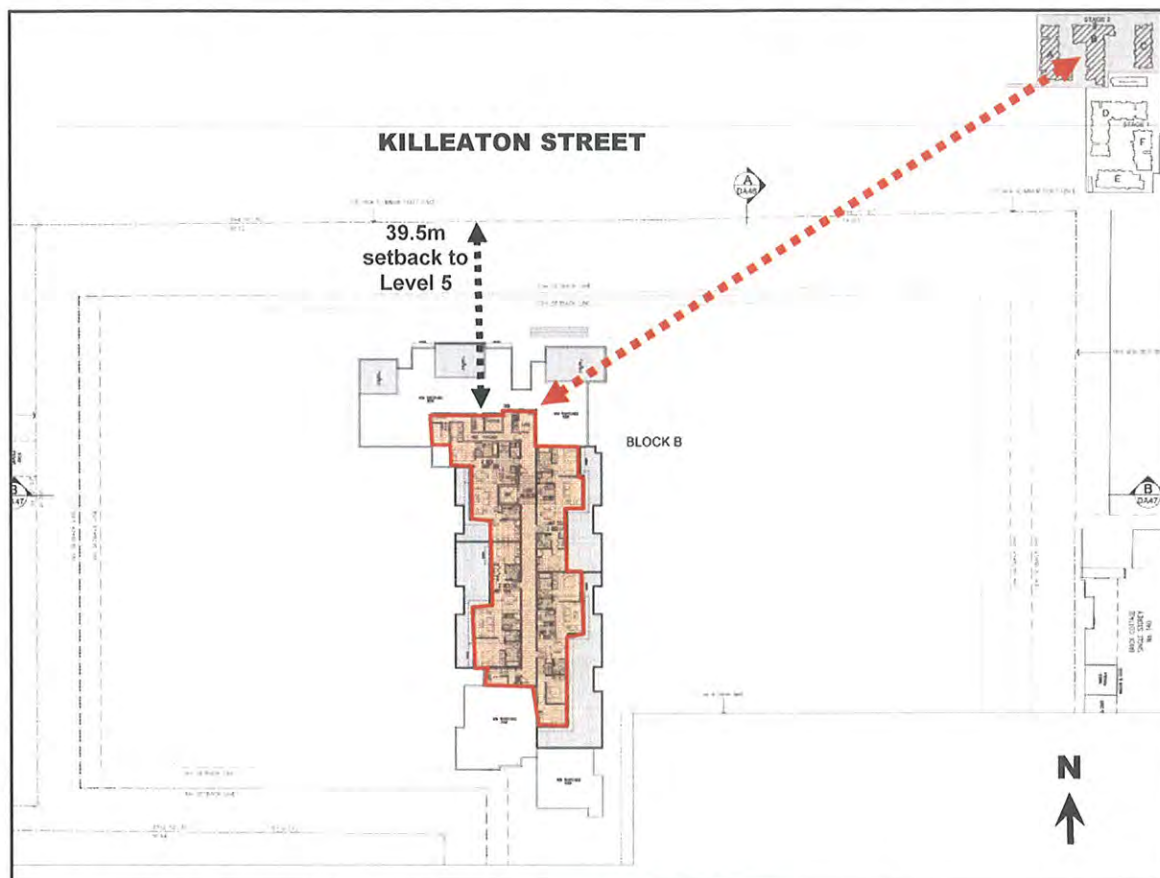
Building B/Level 5 plan detailing extent of non – complying part floor (source: PPR)
